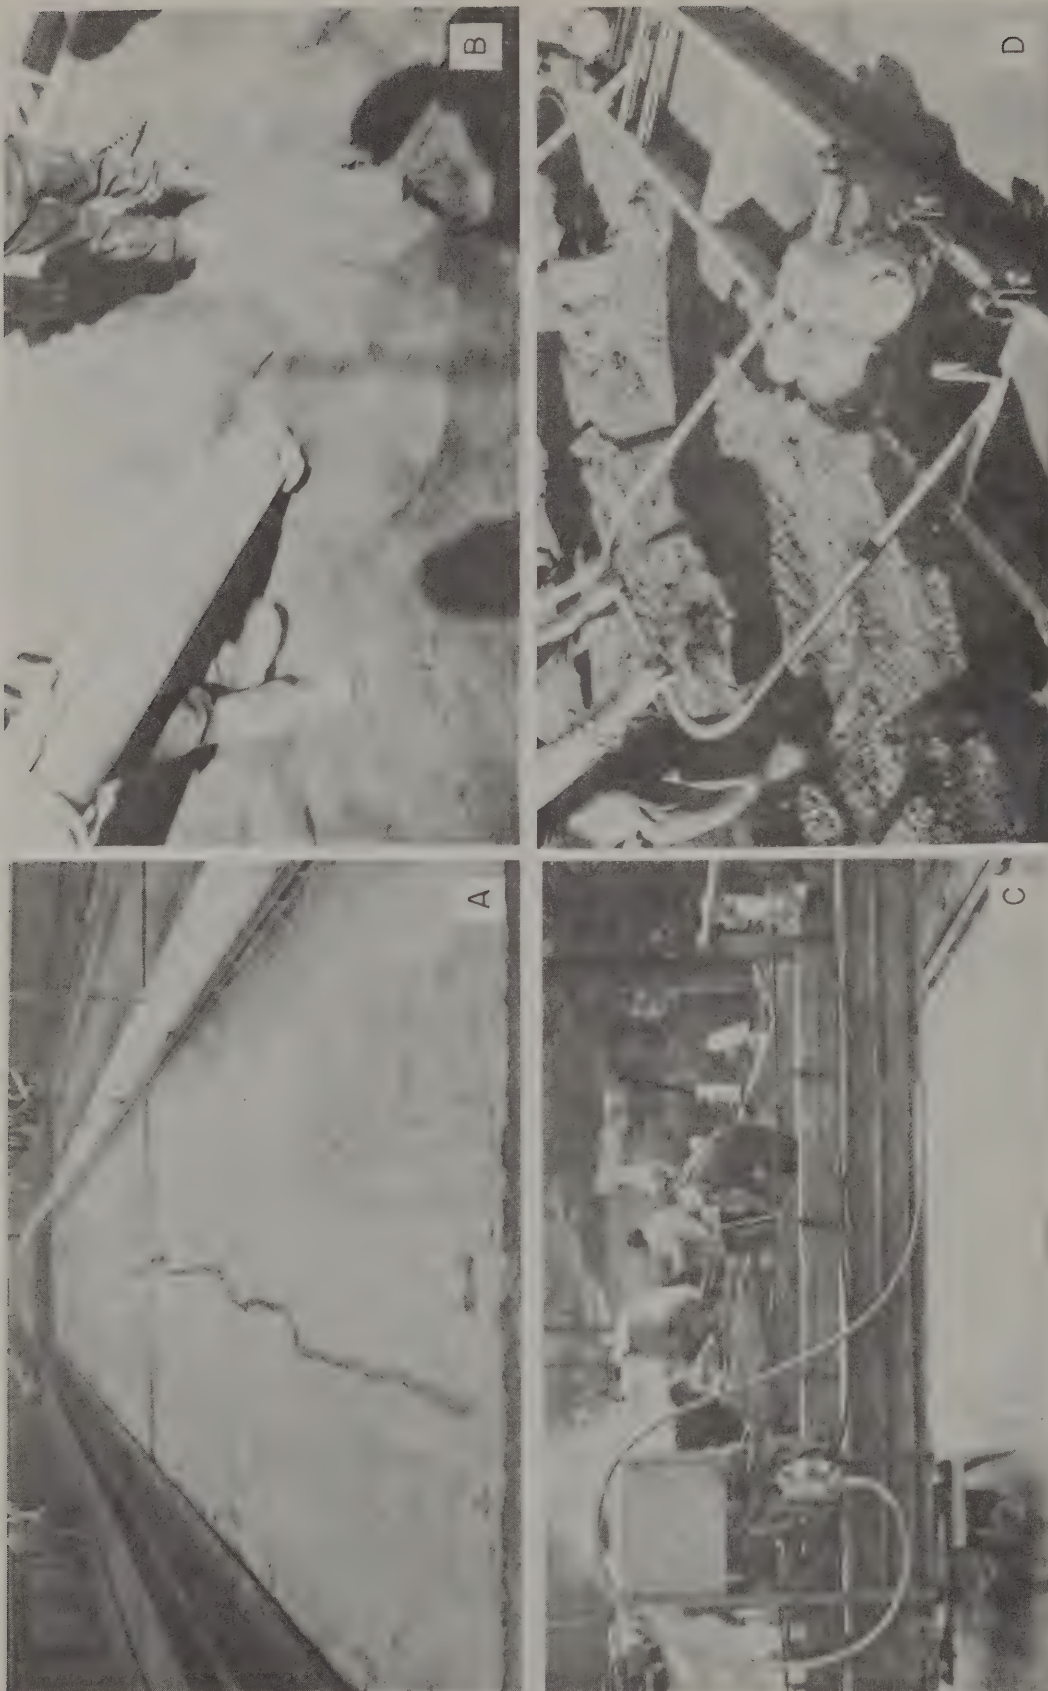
Before overlay application, the structural deck was exposed and cleaned, and longitudinal cracks were sealed (A); fibrous concrete was then placed on the wetted structural deck (B); use of a Borge finishing machine (C), too narrow for a 15-ft pour, was discontinued very early in construction; in its place the contractor substituted a homemade vibrating float (D) to finish the overlay, with good results.
